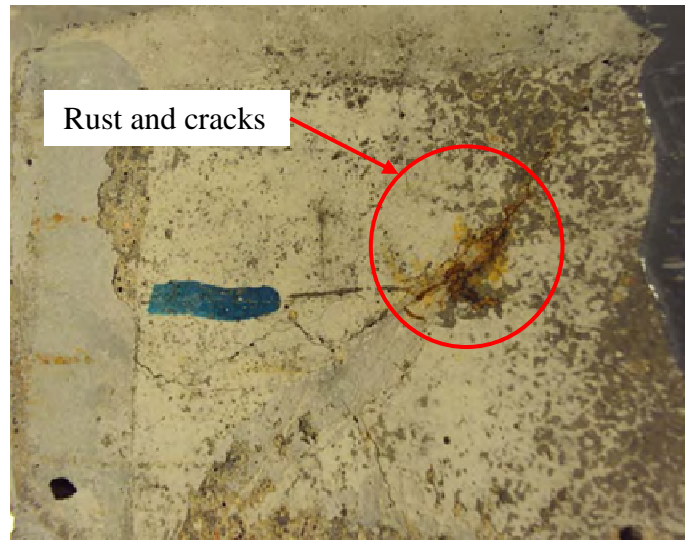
Rust and cracks on specimen SP1-FRC-1
